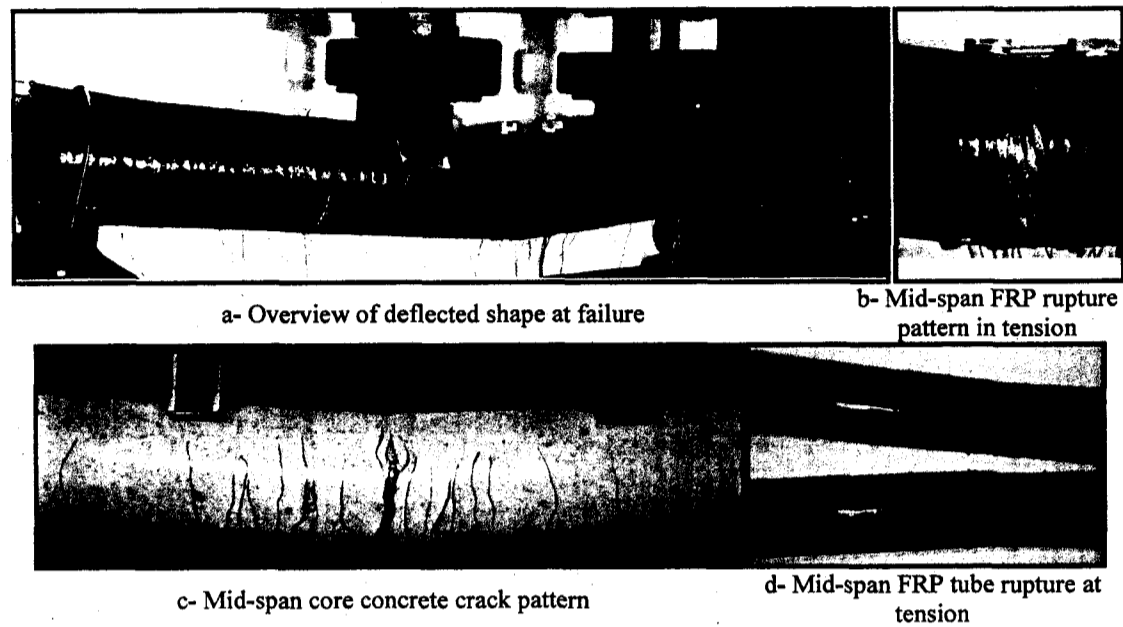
Failure mode and concrete core crack pattern of RCFFT beam E-G-N
